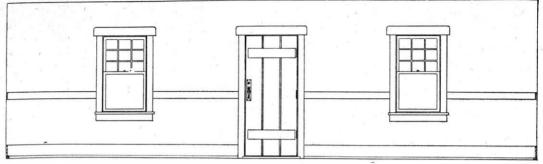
AN ELEVATION OF A PLAIN PLASTERED WALL IN A CRAFTSMAN ROOM SHOWING THE PROPORTIONS AND SPACING OF DOOR, WINDOWS AND CHAIR RAIL.
